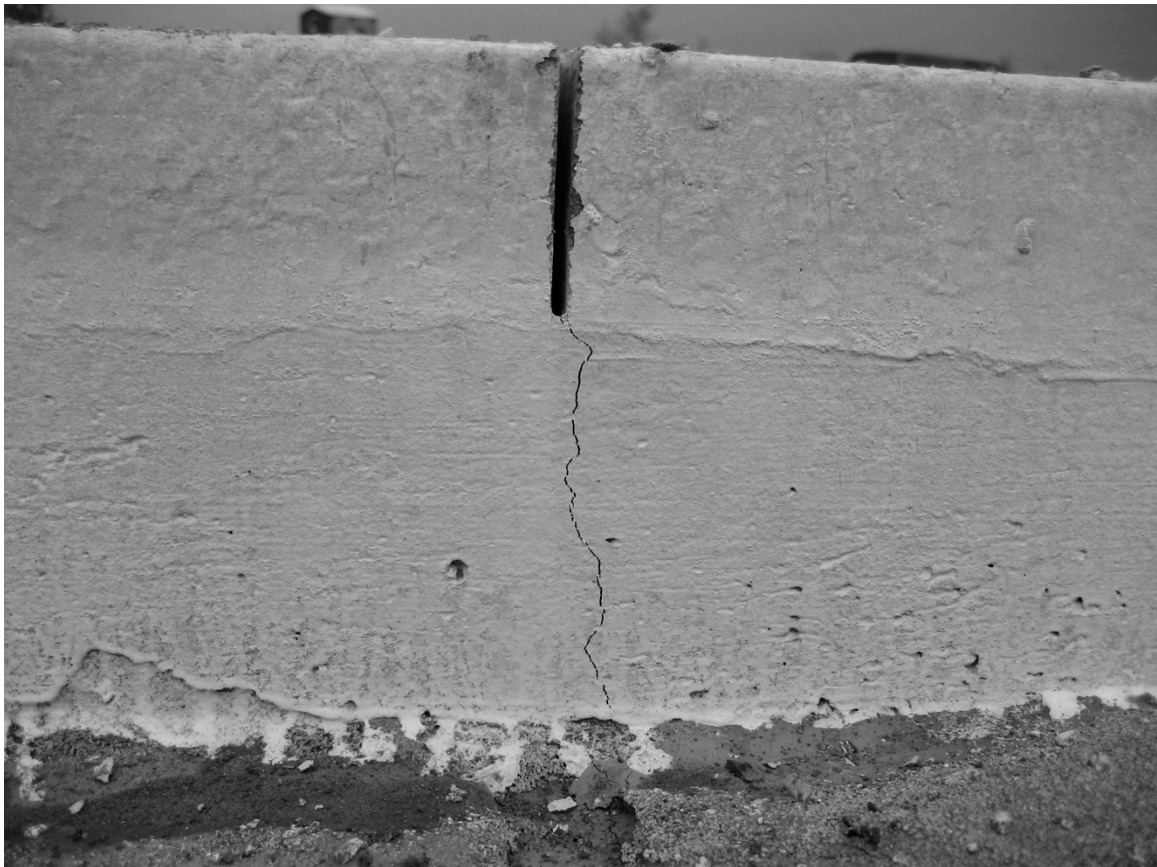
JPCP cracked at sawed joint within 24 hours of paving
